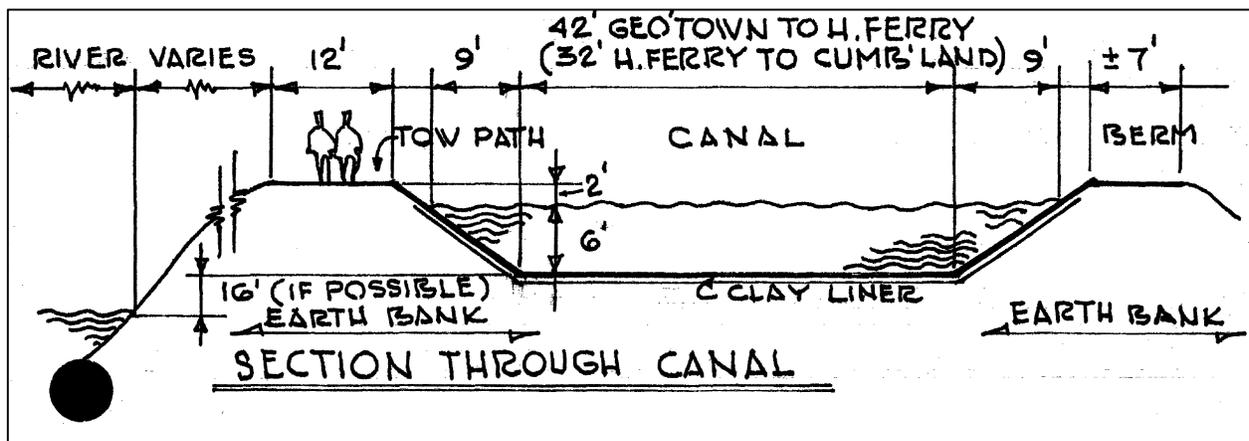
Cross section of the C&O Canal through Georgetown (National Register nomination, 1979).
